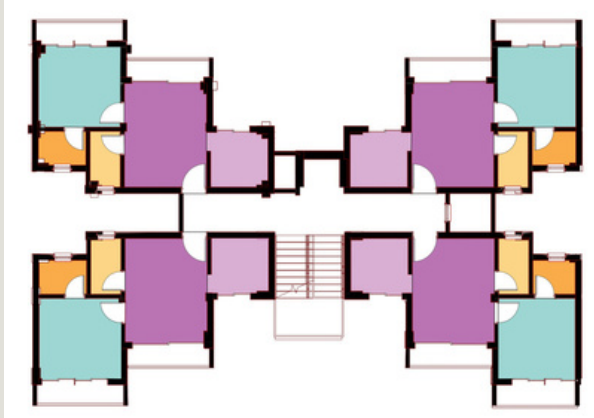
BUILDING 3 PLAN - 1 BHK
